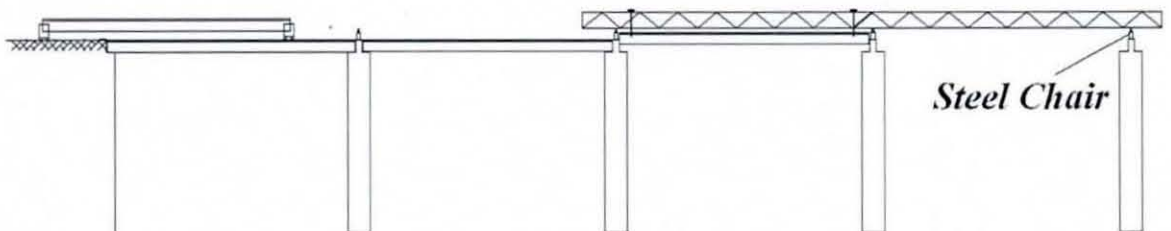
Precast beams are erected on the next span (DSI, 1995)
